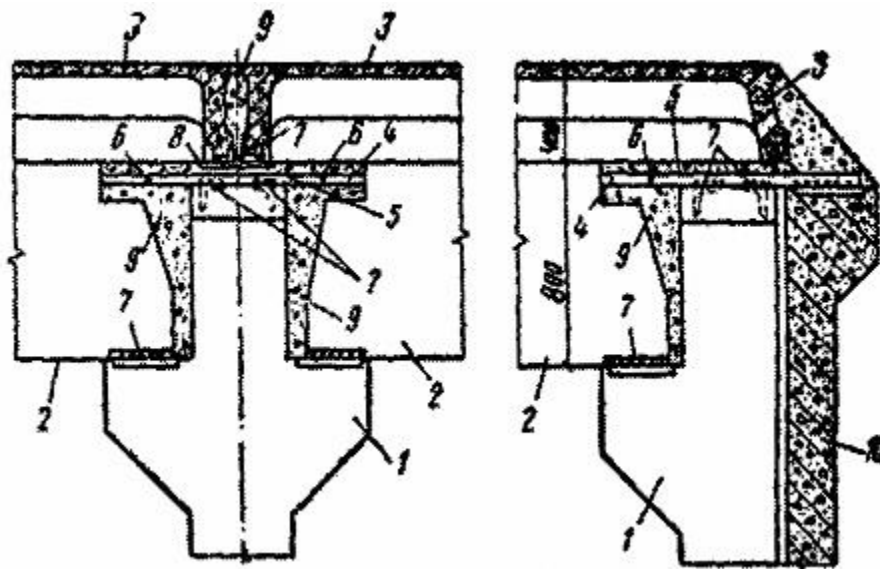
Junction unit of prefabricated roof elements – option for supporting slabs on top of beams:
